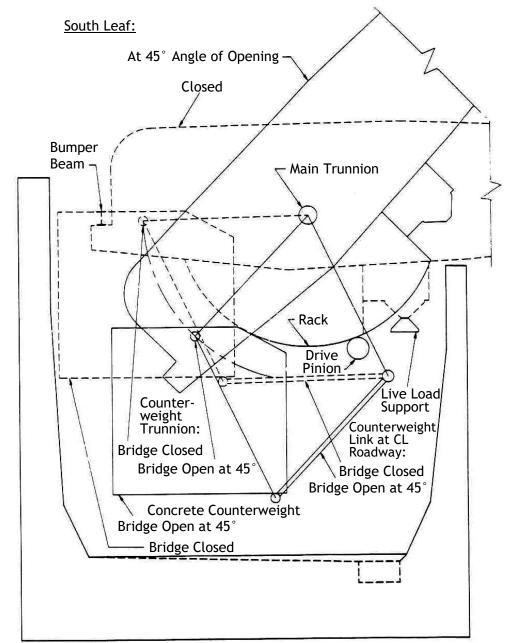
Multi-Trunnion, Strauss Type Bascule Bridge
